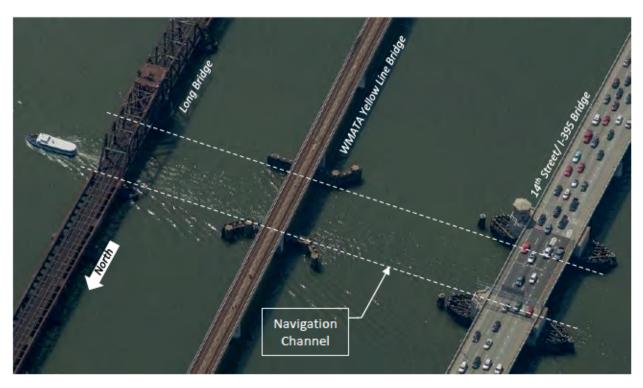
Navigation Channel Span Arrangement of Long Bridge and Upstream Bridges⁷
